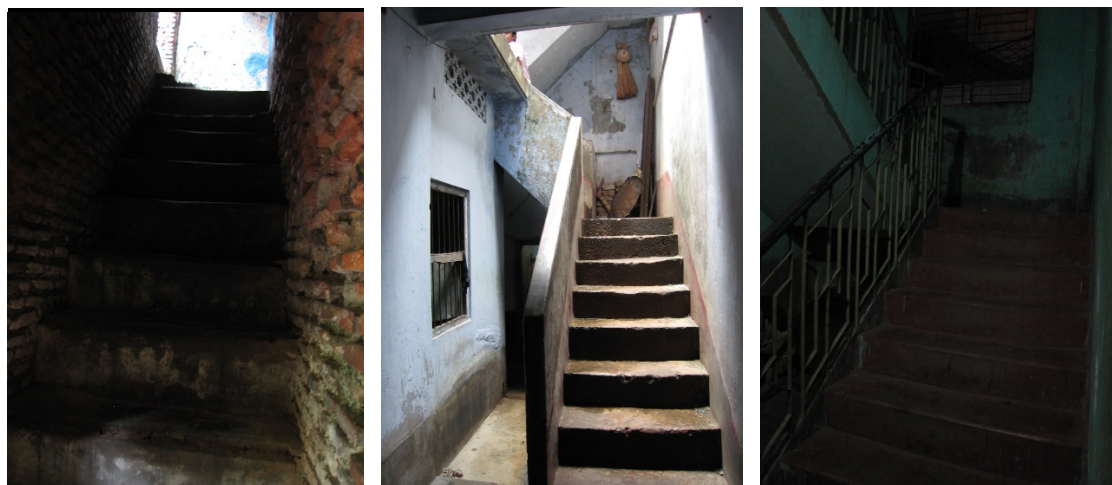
Stair leading to the roof top court in an old building (left) in a new building (middle) and main staircase in the first floor of a new building.
